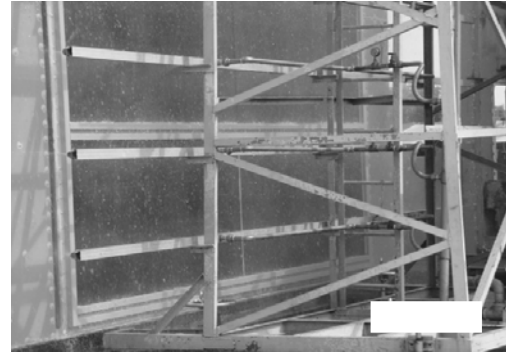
Structure glass Curtain wall [Hsueh & Huang 2002].
